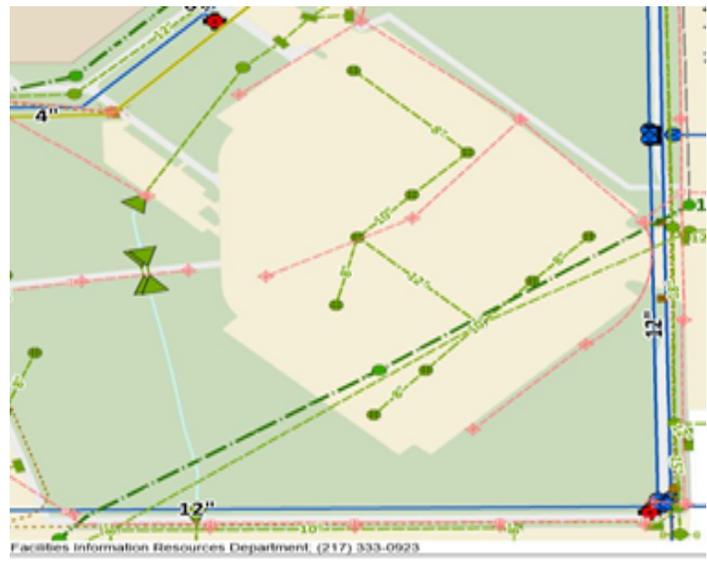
Drainage plan retrieved from Facilities & Services Department
